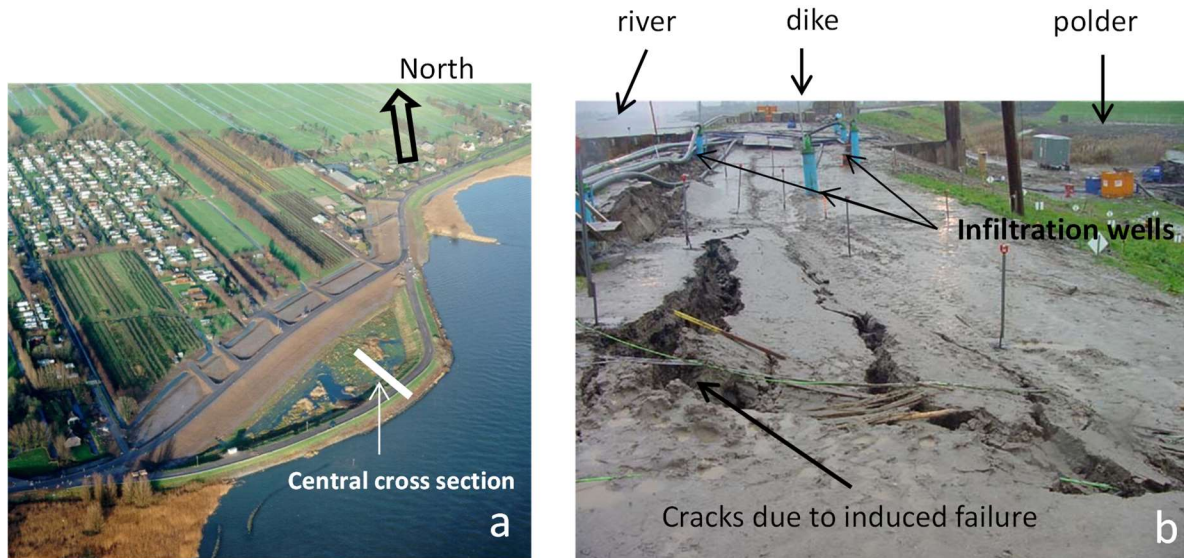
Test site, a; aerial photograph before testing, arrow indicates North direction, white line indicates the location of the central cross section shown by Figure 29, b; failed dike body after testing
